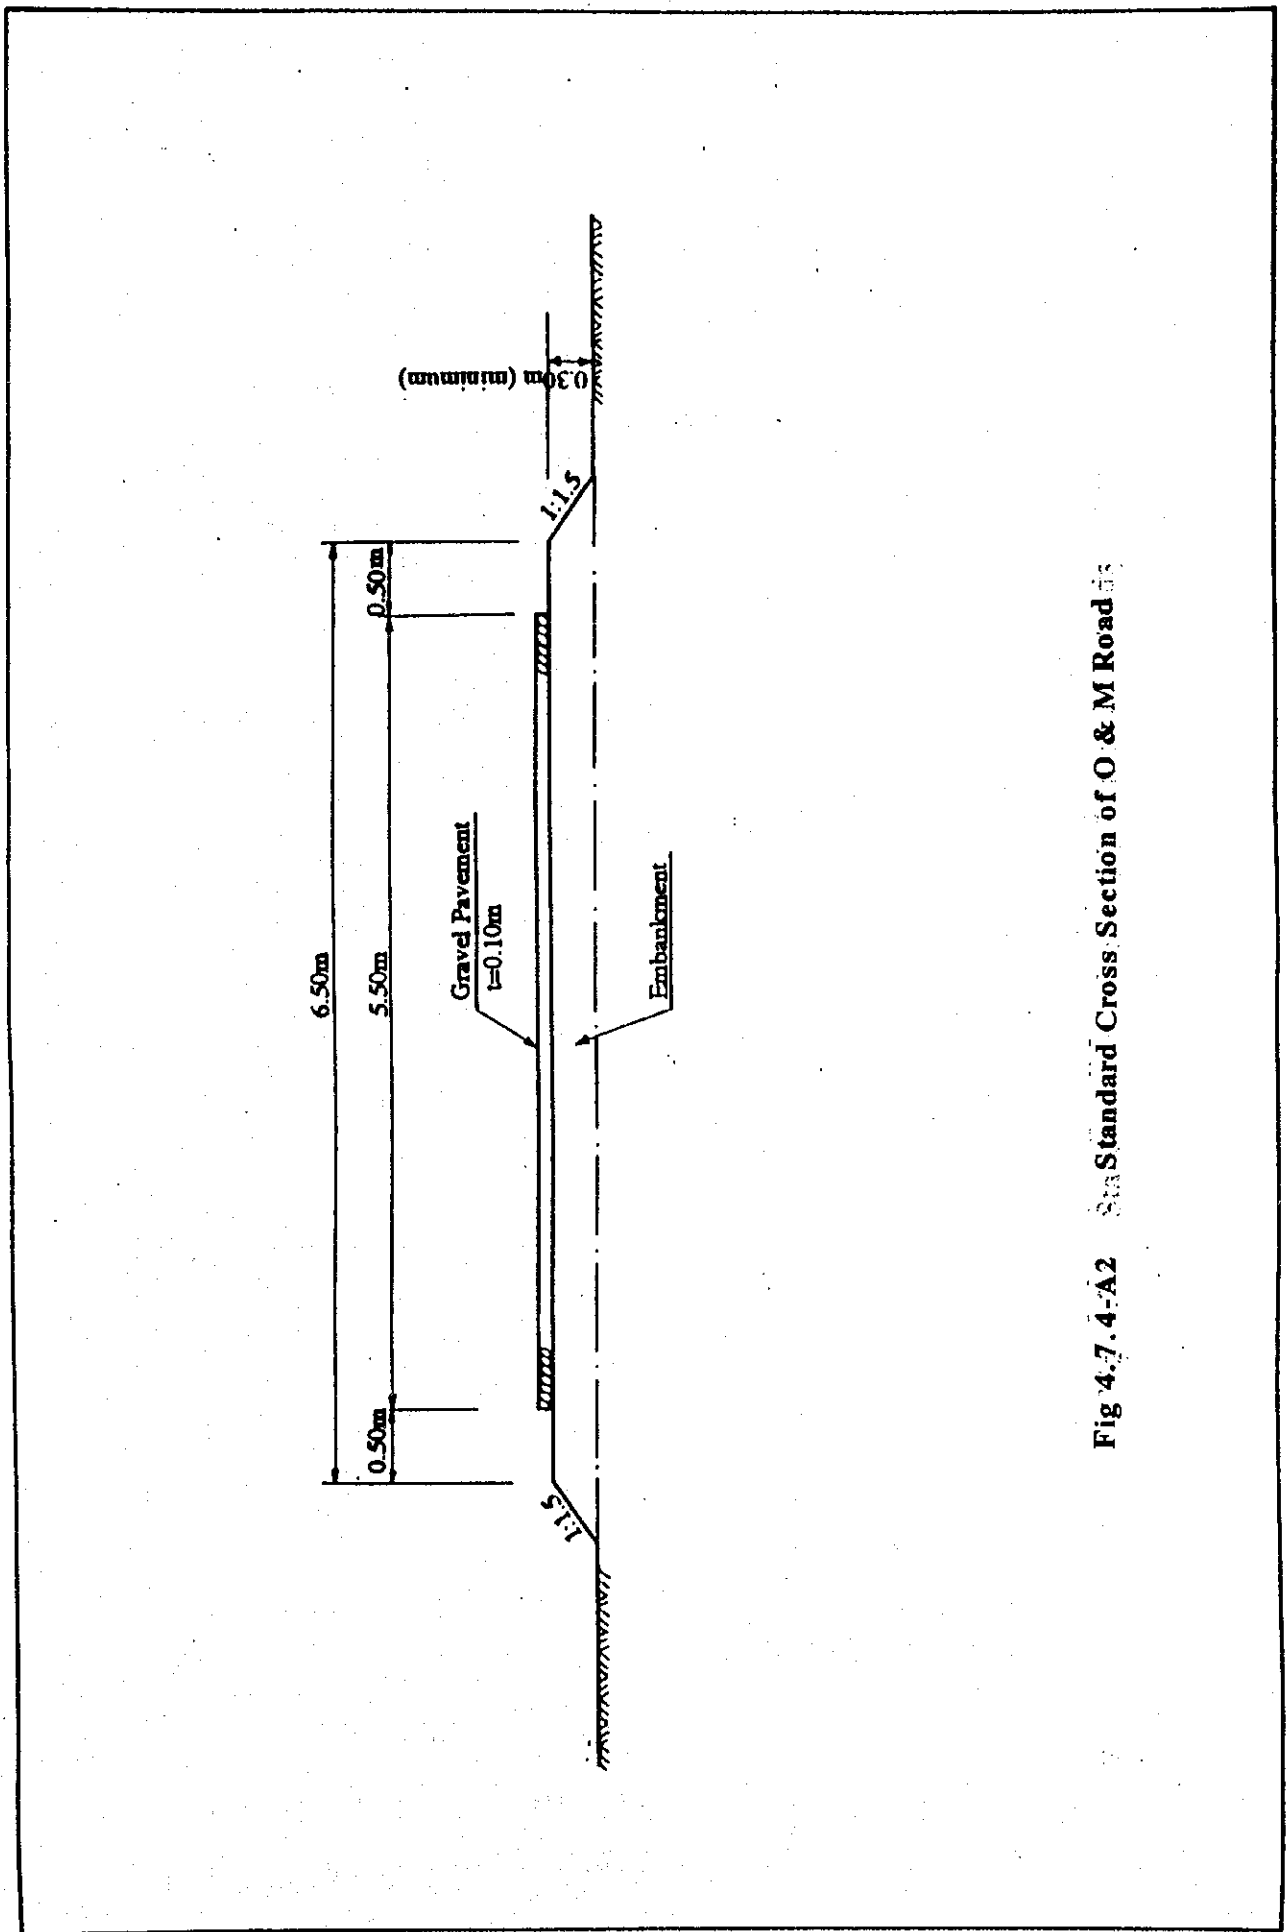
A2 Standard Cross Section of O & M Road
